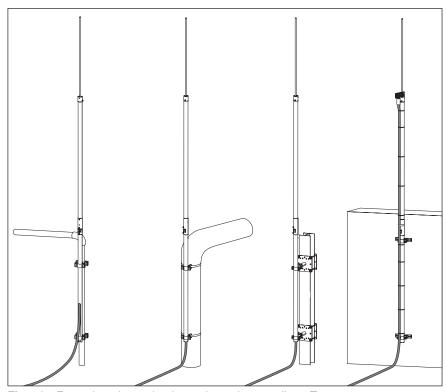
Fastening air-termination rods to pipes, walls or T supports
